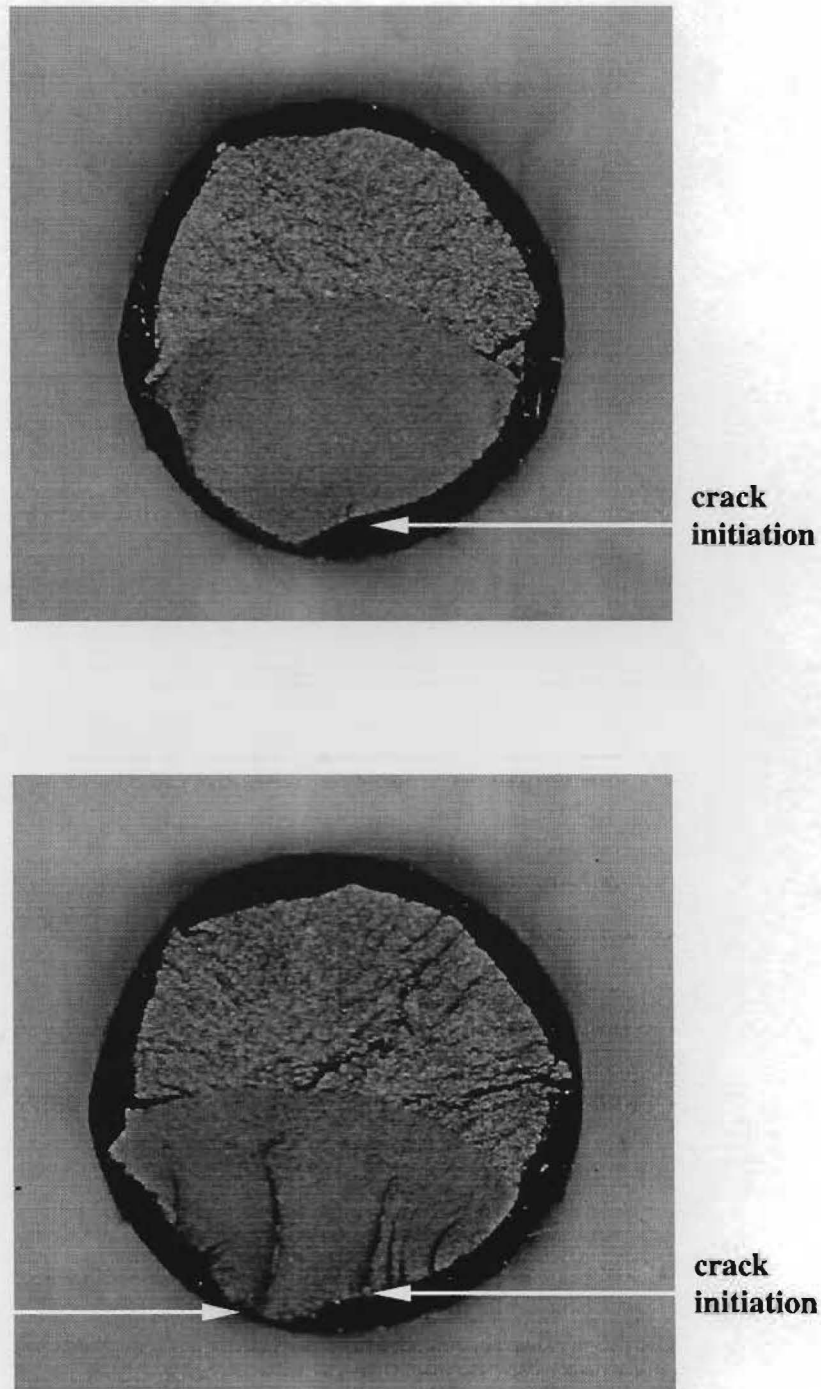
Fatigue Crack Surfaces on Ch5S Bars
